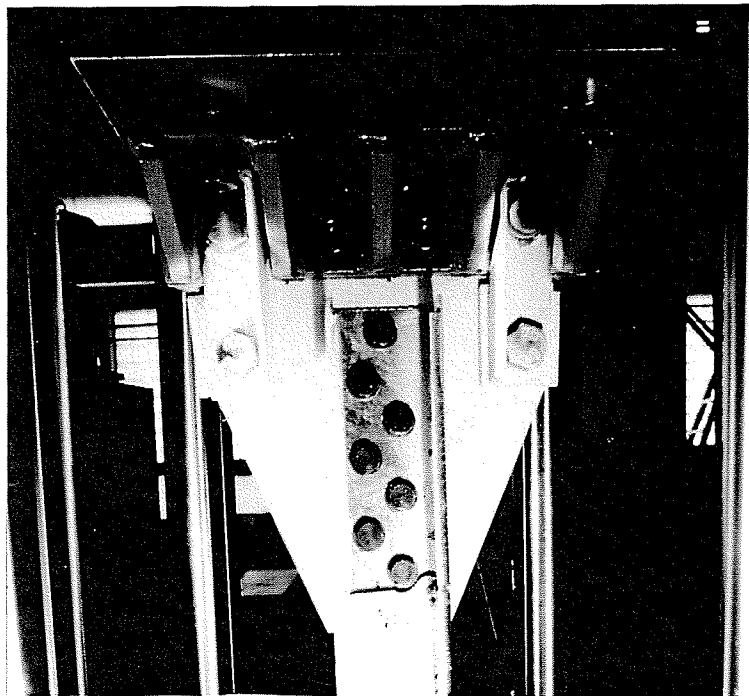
End Connection Used for Testing Back-to-Back Channel Sections.
